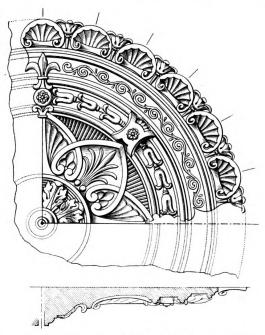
Partial Plan and Horizontal Section of a More Complicated Design.
